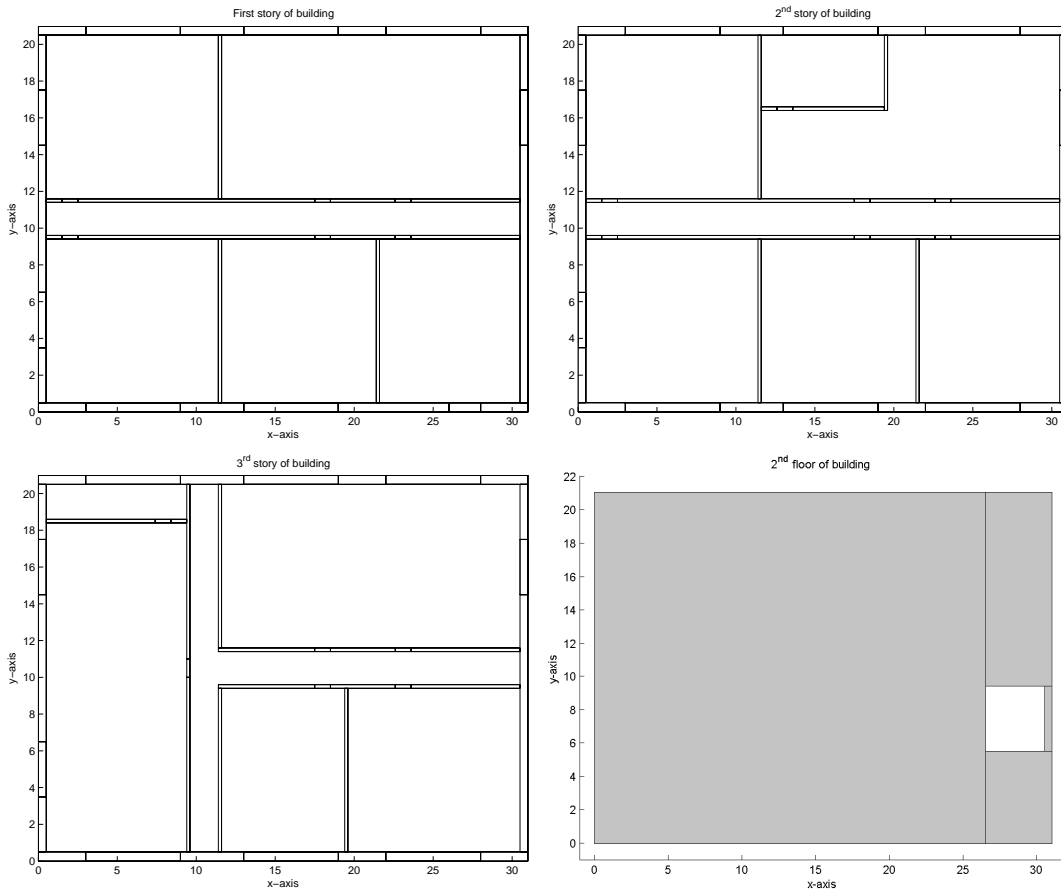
A plan view of three stories in the sample building and 2nd floor.
